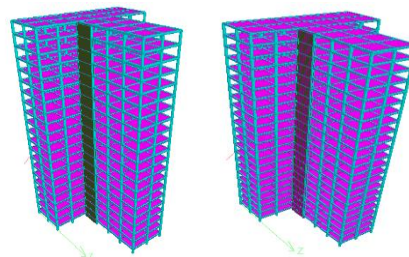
(b) T-Shape G+20 and G+22 Building with shear wall
